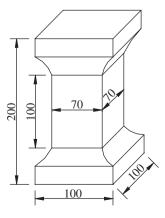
Dimensions of dumbbell-shaped specimen (unit: mm).
